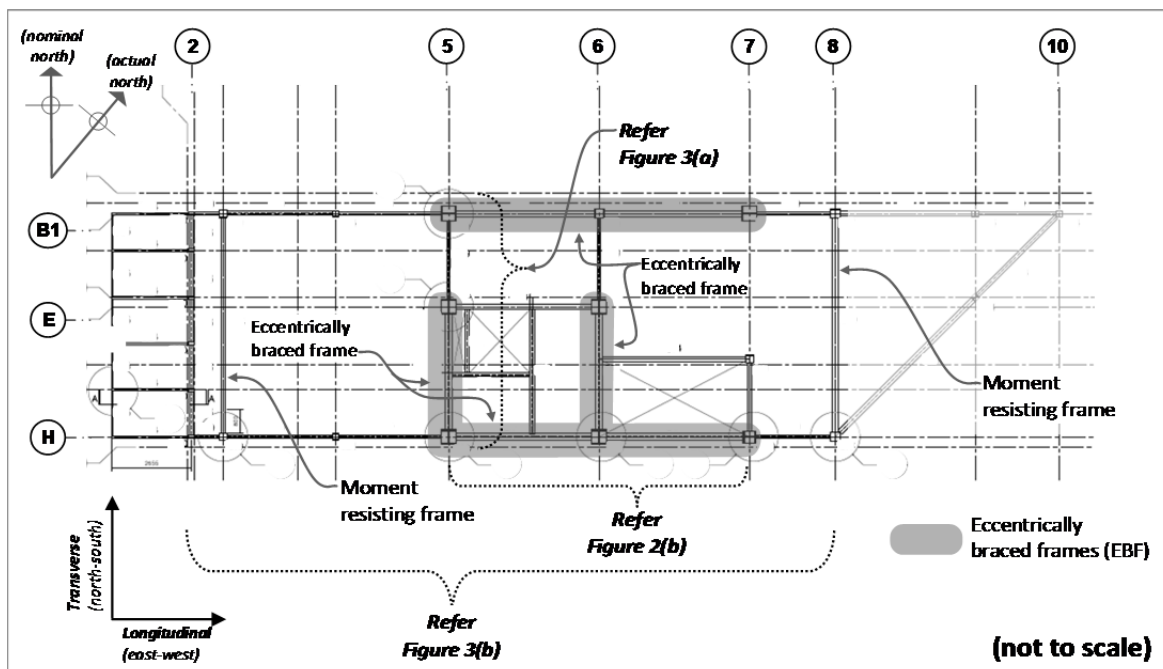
Building floor plan showing key gridlines - taken from building consent Drawing 100-S-016
